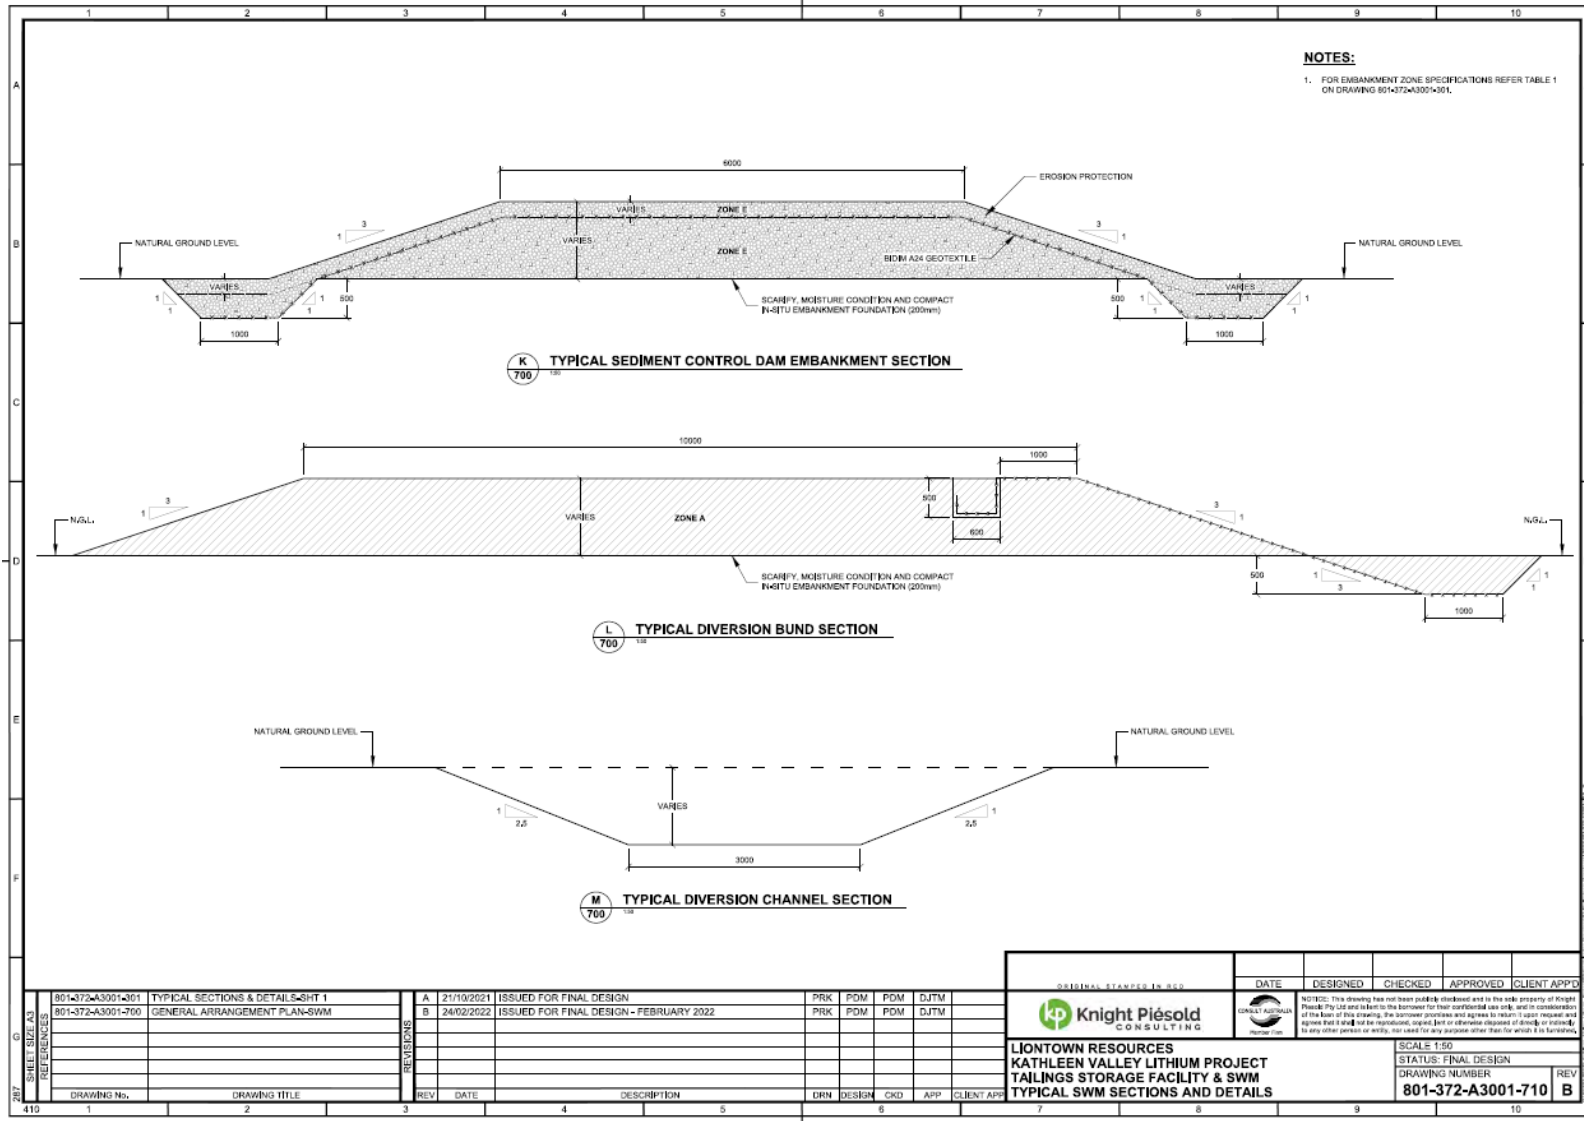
Tailings Storage Facility Surface Water Management, Typical Diversion Bund Section– 801-372-A3001-710
